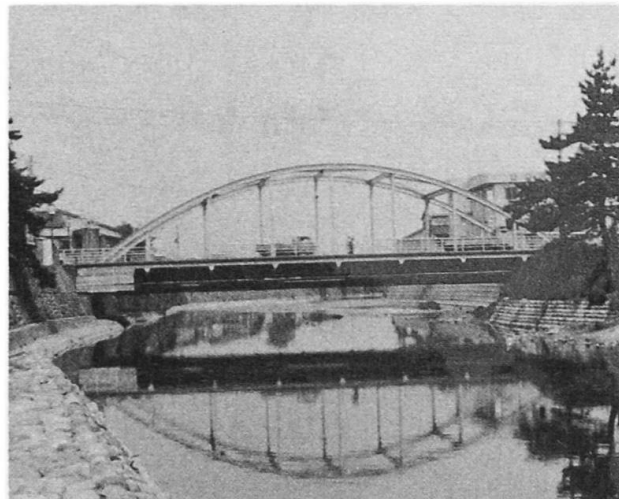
View of NAKAJIMA bridge (constructed 1955).
